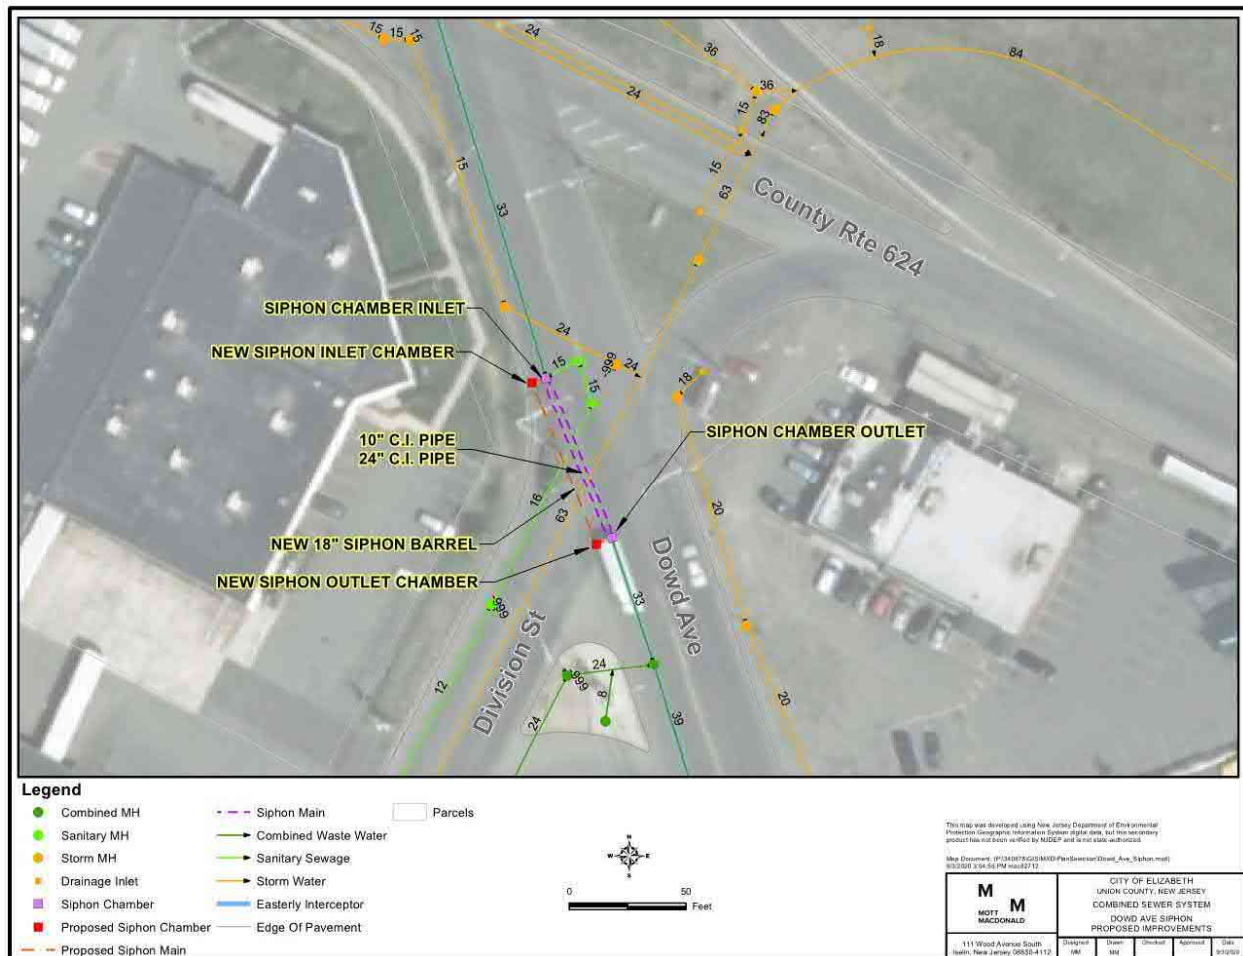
Proposed Dowd Avenue Siphon Upgrade
